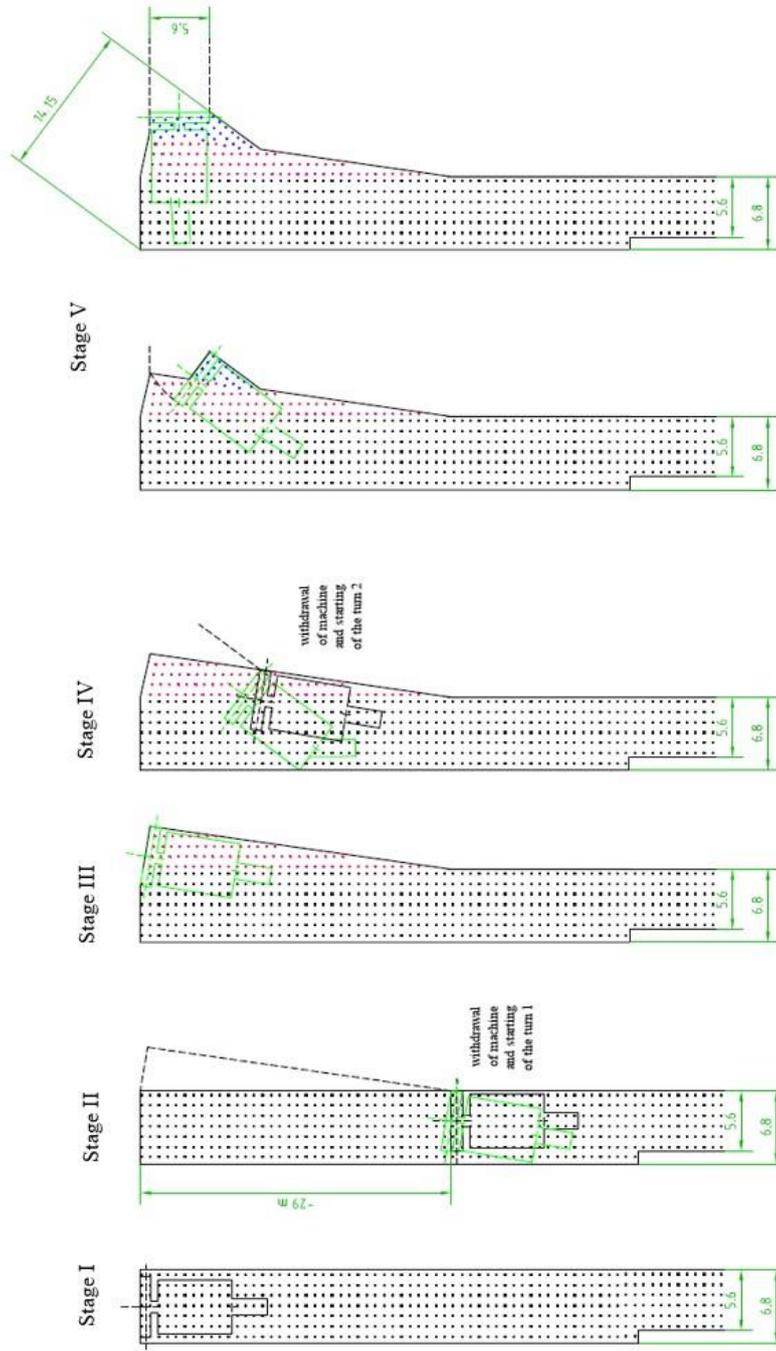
Schematic diagram of driving the bend at the angle of 90° with a “short” departure - 29 m and a narrow (5.6 m) inlet to a new working
